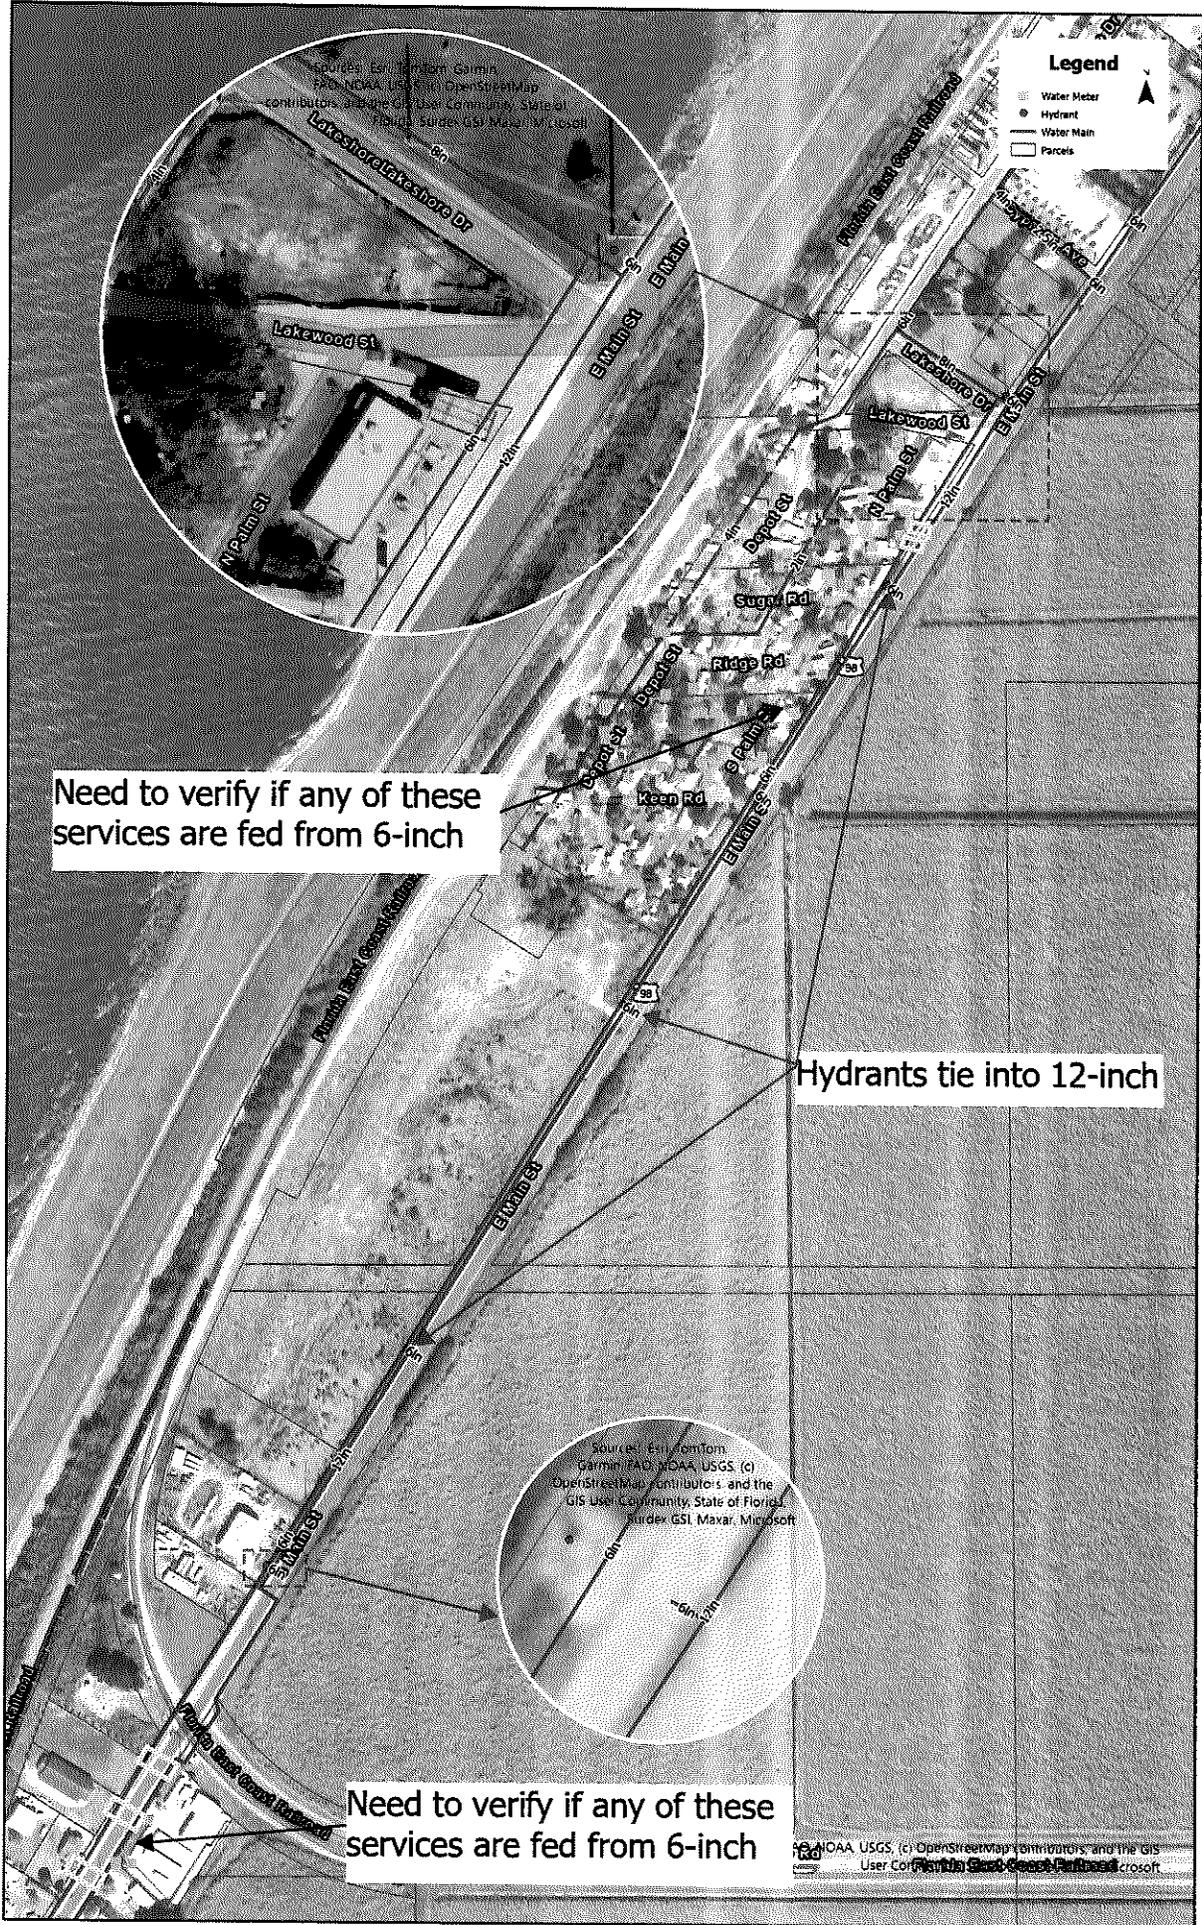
From Rock Pit Road to FEC Railroad Road
